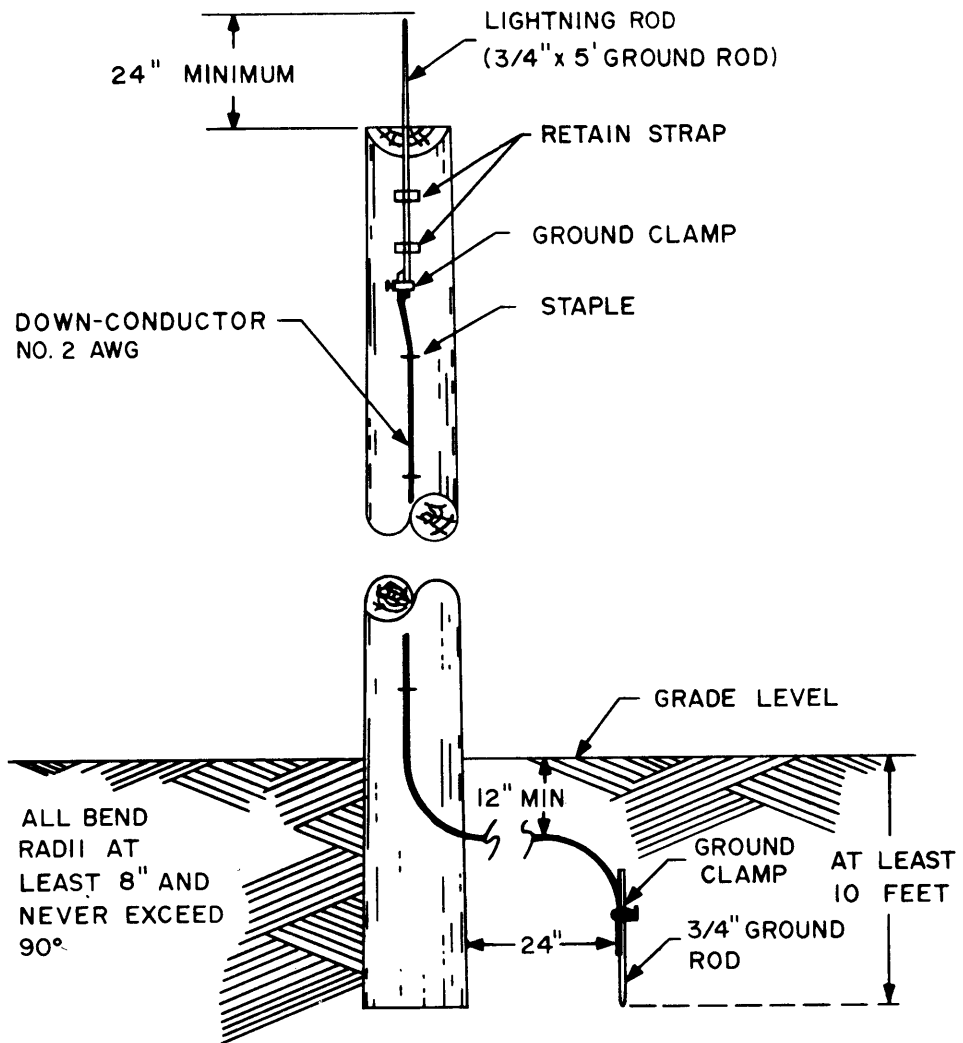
Typical Lightning Rod and Down-Conductor Arrangement
